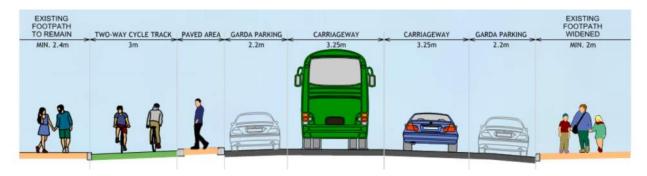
Typical Section 6 Option A Cross Section Henry St - Two Way Cycle Track
